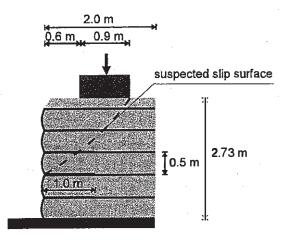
Cross-section of the full scale test abutment (after Thamm et al. (1990))
